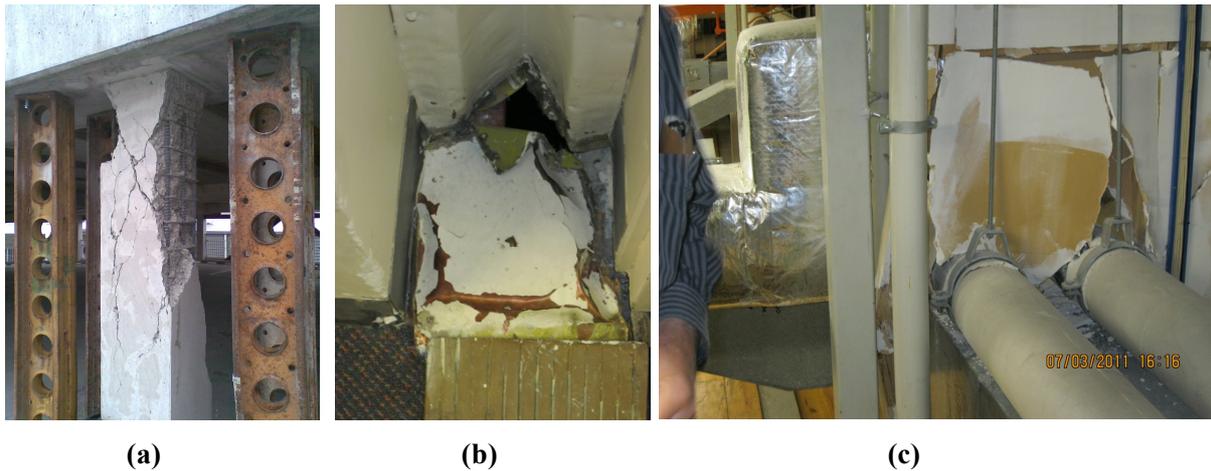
Observed structural damage in non-clinical and clinical buildings: a) spalled concrete in ground-floor column of a parking structure, b) separation joint damage in Riverside Building, and c) damage to firewalls in the CWH (photo credit, Alan Bavis).
